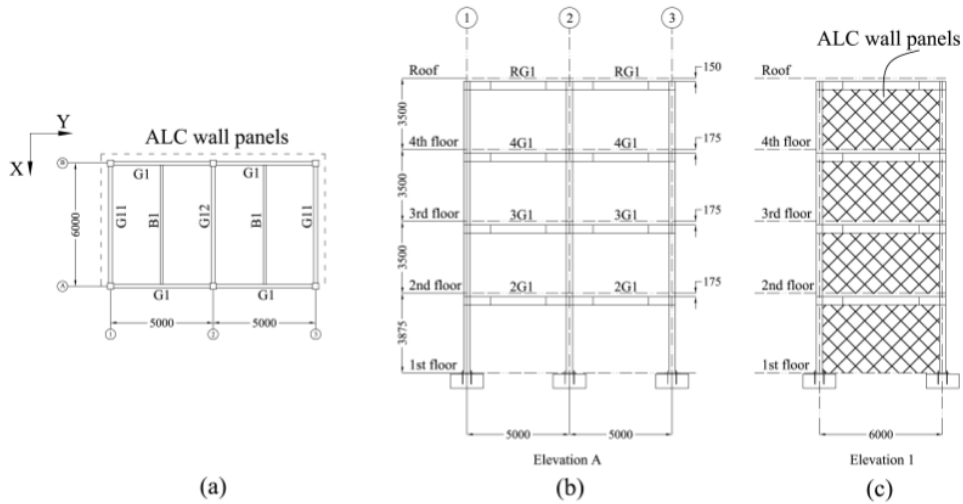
Four-story prototype building: (a) plan view of a typical story, (b) Y-elevation, and (c) X-elevation (units: millimeters)
